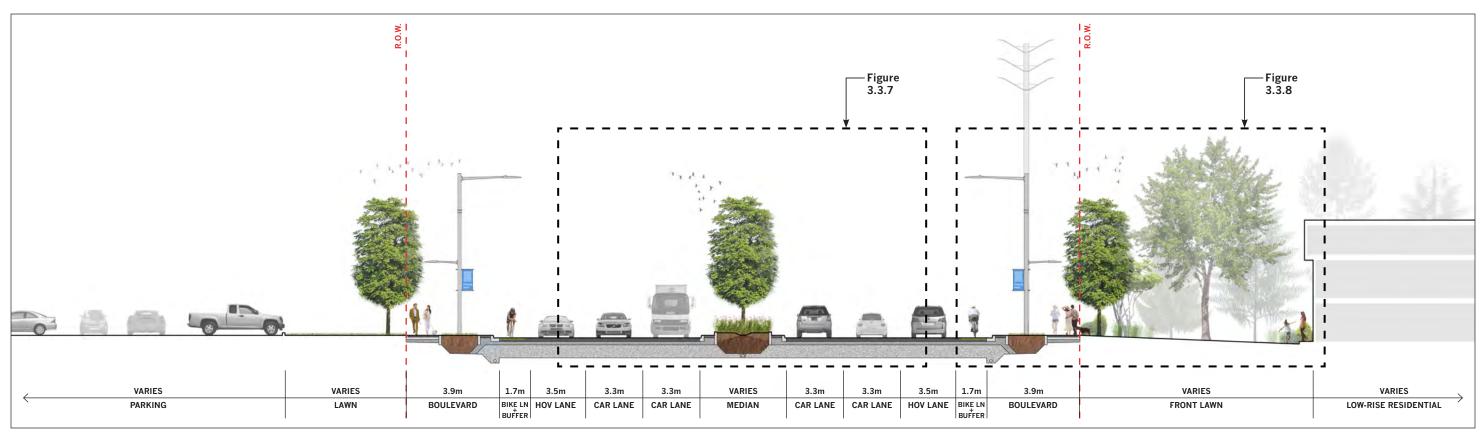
Keele Street streetscape concept section [Existing land use].
